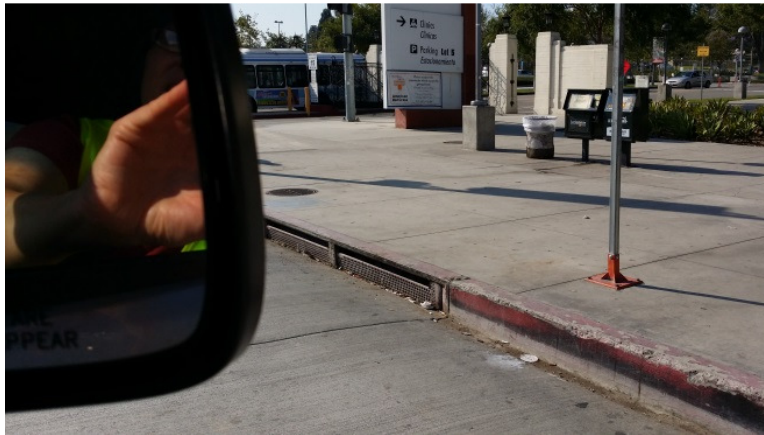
Storm Drain Inlet with Screens Along Marengo Street
